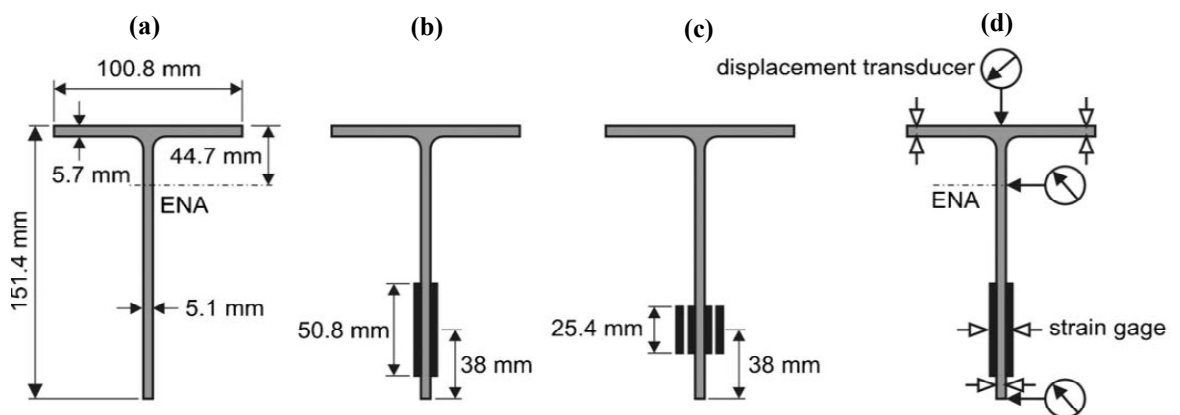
Specimen details (a) Control specimen, (b) CFRP-1 and GFRP-1, (c) CFRP-2 and GFRP-2 and (d) instrumentation (Harries et al, 2009)
